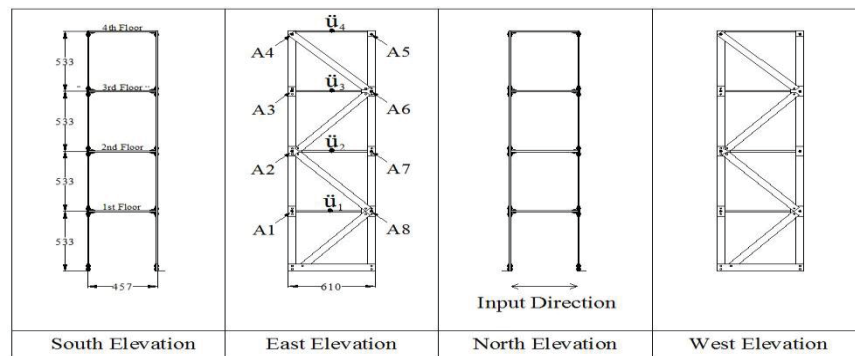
Elevation views of the steel frame employed in the experimental application. Dimensions are in mm
